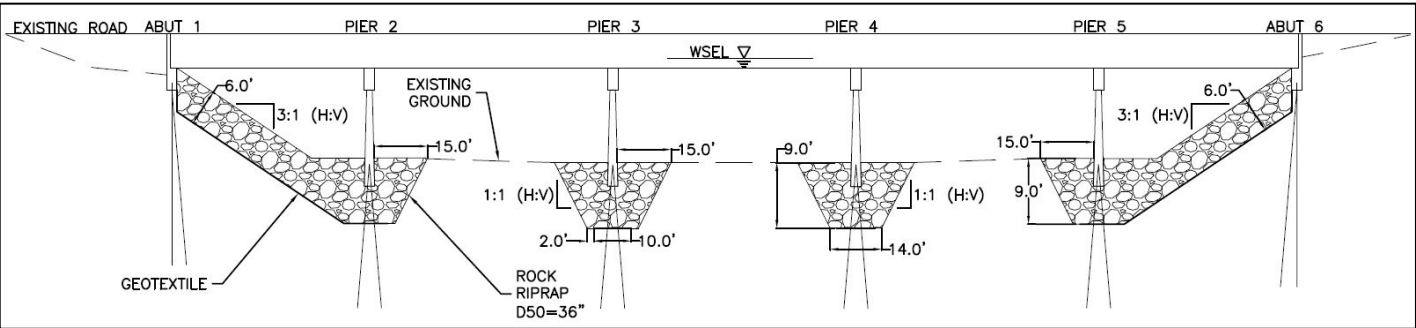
Cross-sectional view of Bridge E-10-A with recommended hydraulic scour countermeasures
